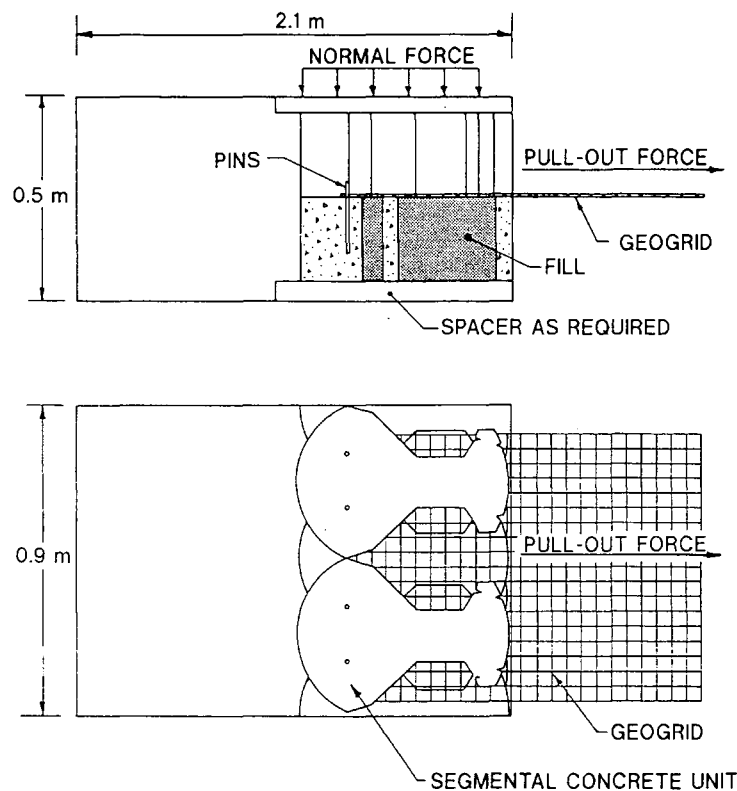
Schematic connection test configuration: *top, side view; bottom, top view (not to scale).
